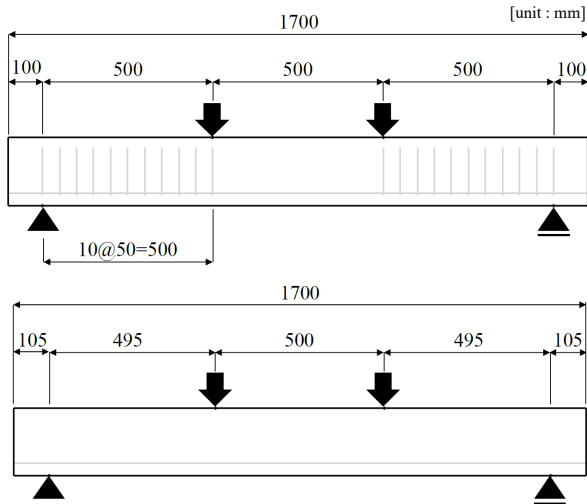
Outline of RC beams (upper: flexural specimen, lower: shear specimen).
